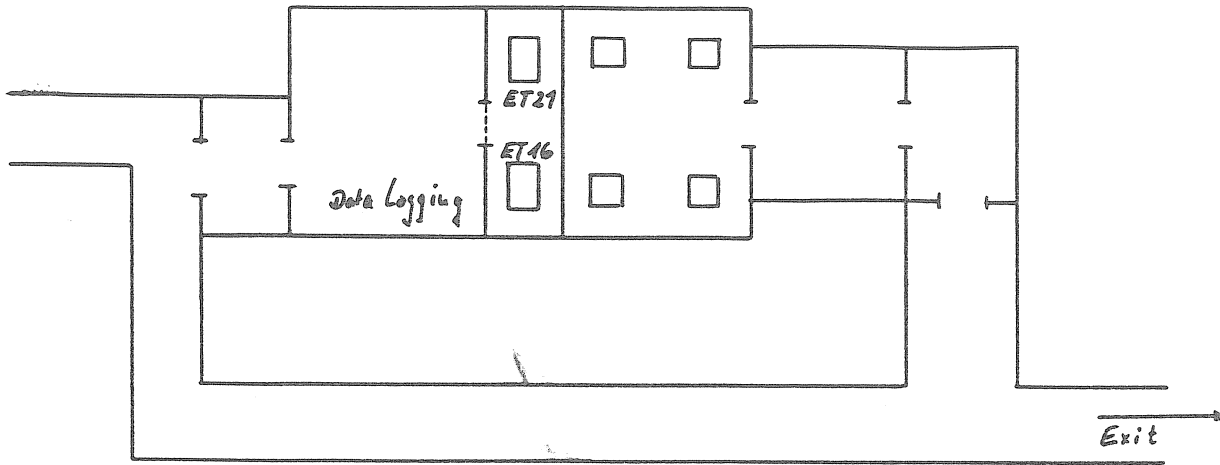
Wuchang underground laboratory with 6 pillars for tidal observation
